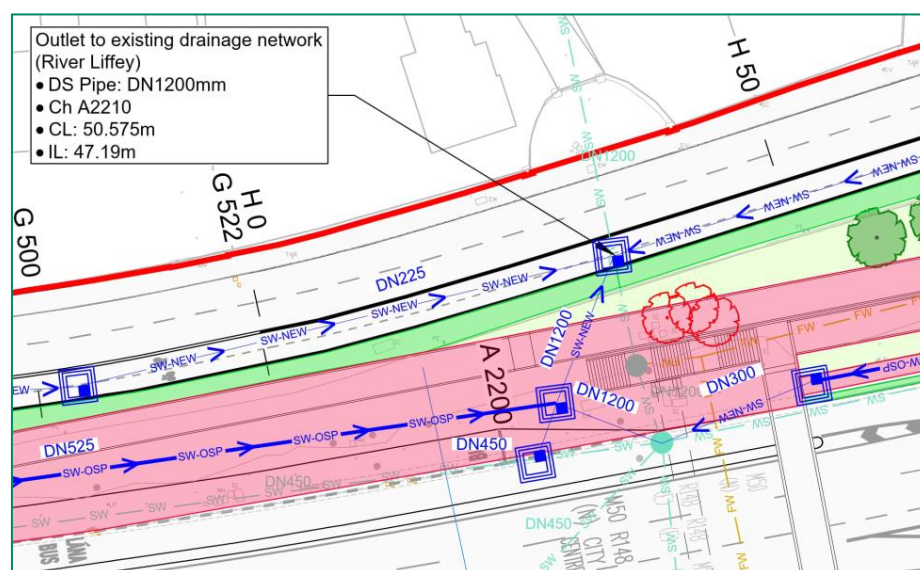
Extract of Proposed Surface Water Drainage Works drawings at the proposed N4 Liffey Valley Pedestrian Bridge (Sheet 8)
